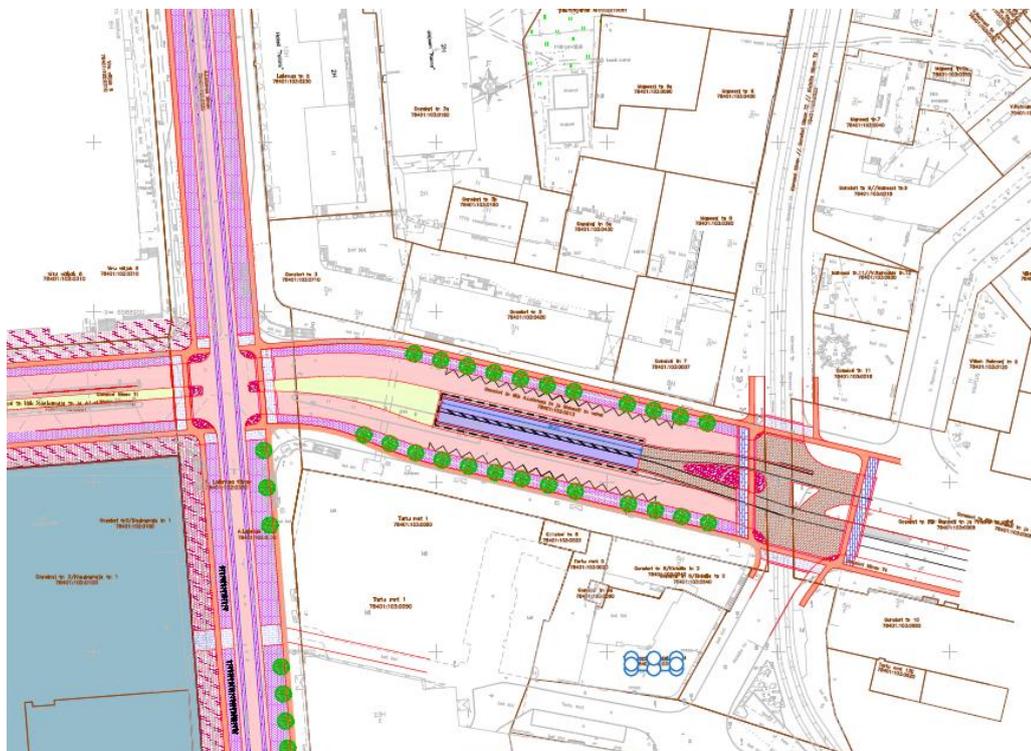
Tram solution - Section on Gonsiori Street; impossible to implement due to future tunnel construction. – Egis
